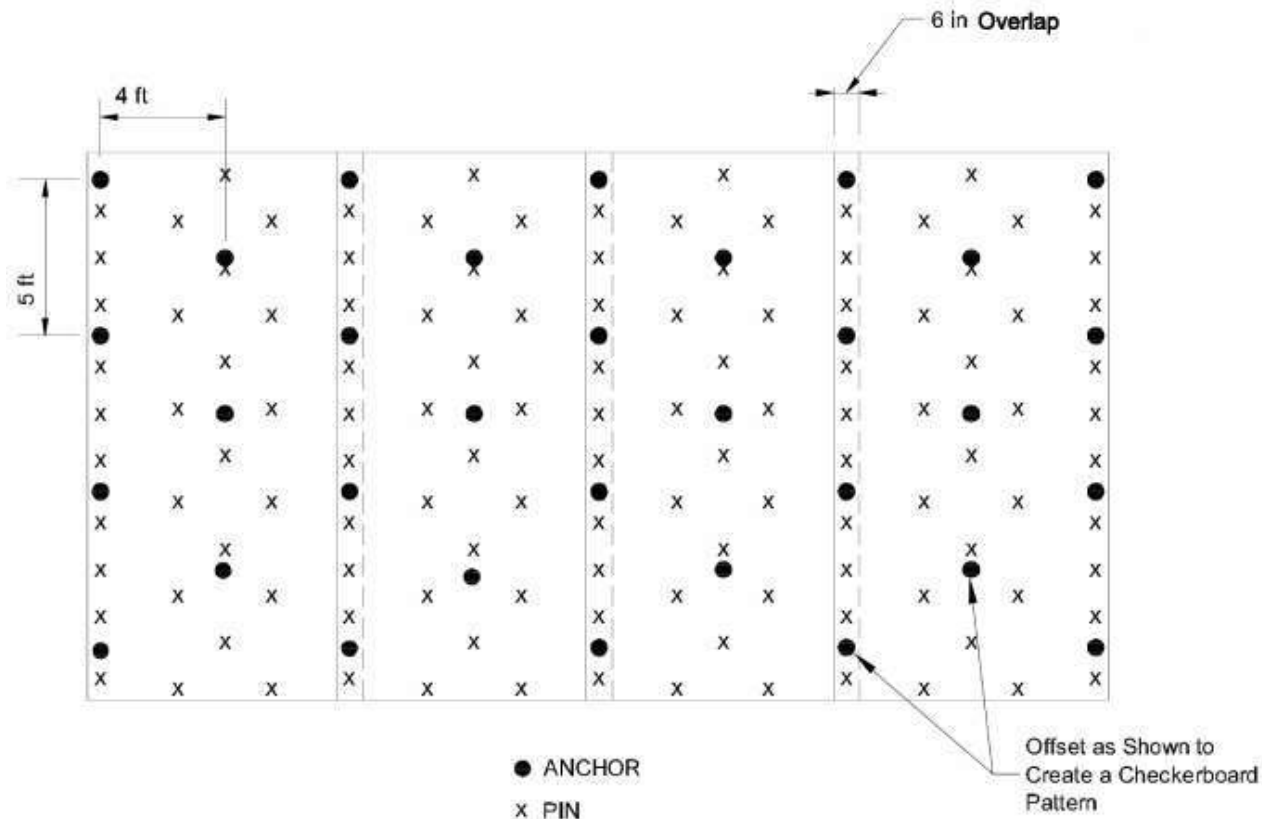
TYPE B2 ANCHOR / PIN PATTERN DETAIL FOR SLOPE FACE
